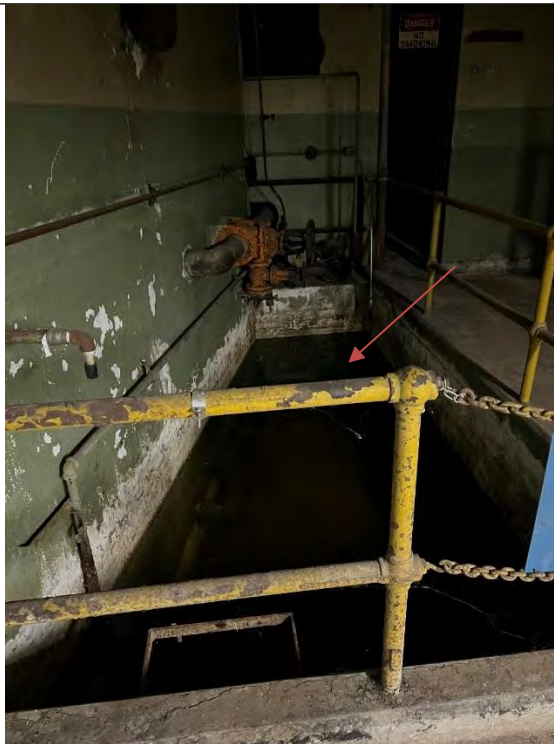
Pit in Basement Adjacent to Right Draft Bay Wall Looking Upstream
